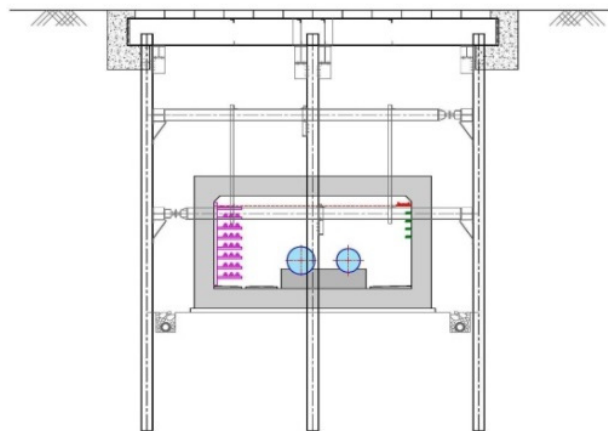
A illustration of the excavation utility tunnel with road decking panels
